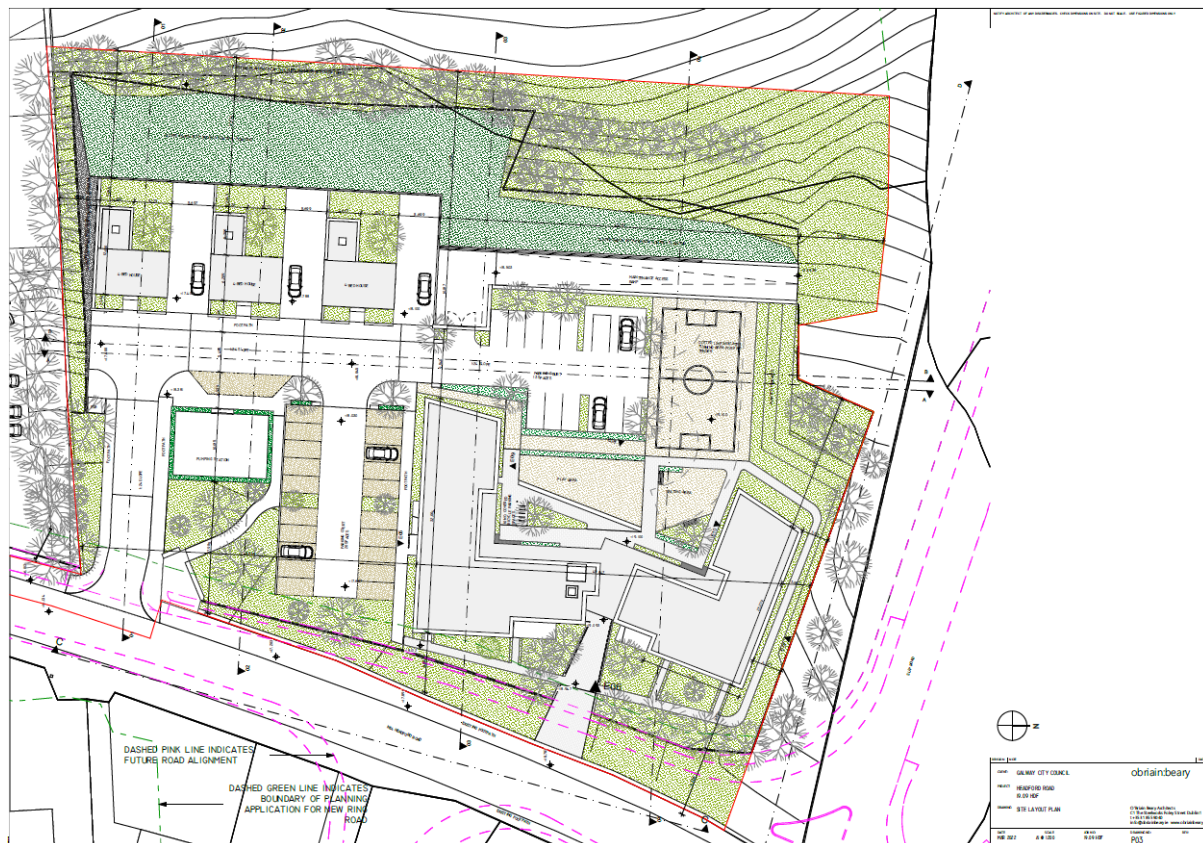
Site Layout Plan (O'Briain Beary Architects, 2022).
